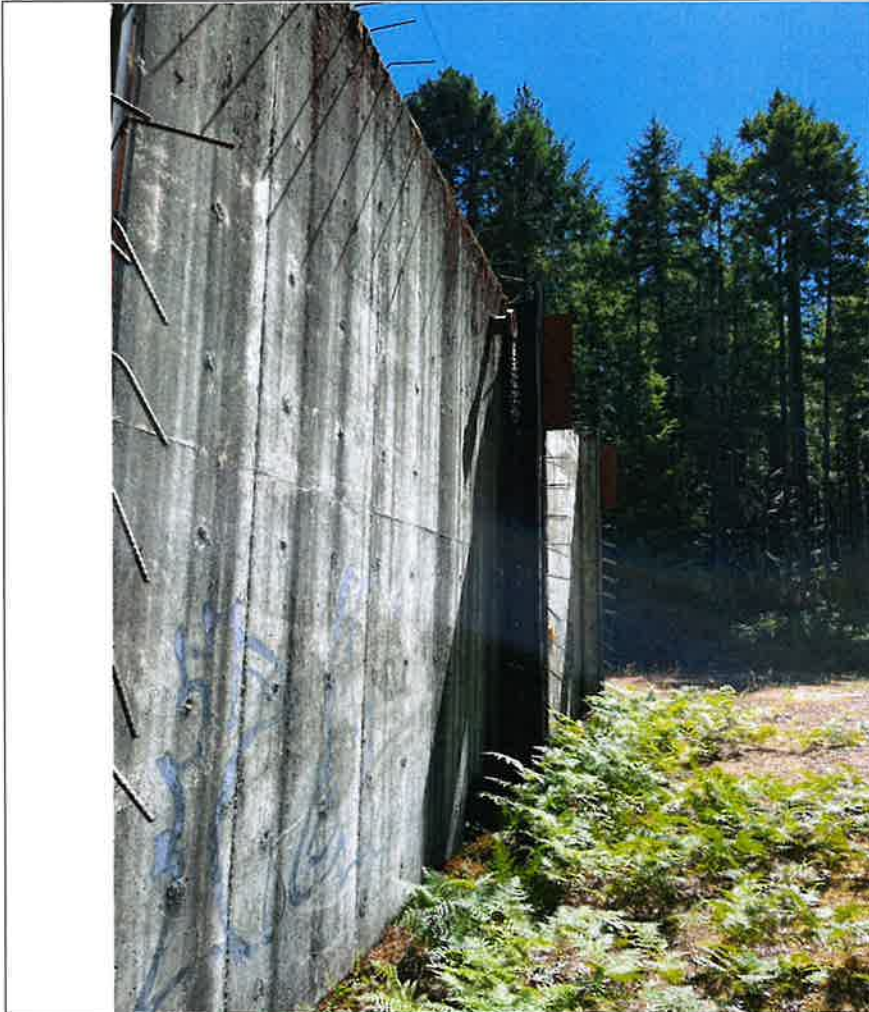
A view of the exposed rebar on the south side of the water tank.
